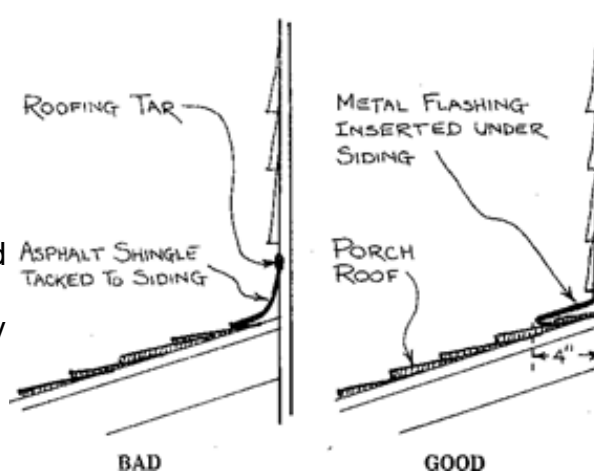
Illustration of good and bad porch roof flashing (The Old House Journal, 1981, p. 224).
